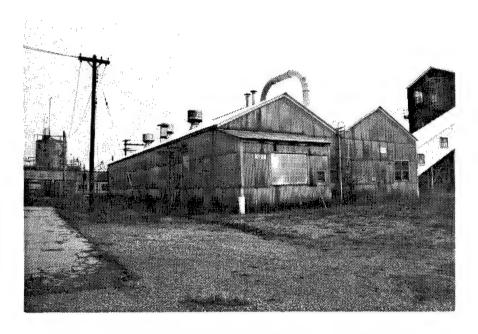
Buildings 122-3 and 104-3: A Cotton Dry House connected to a Wood Pulp Dry House.
